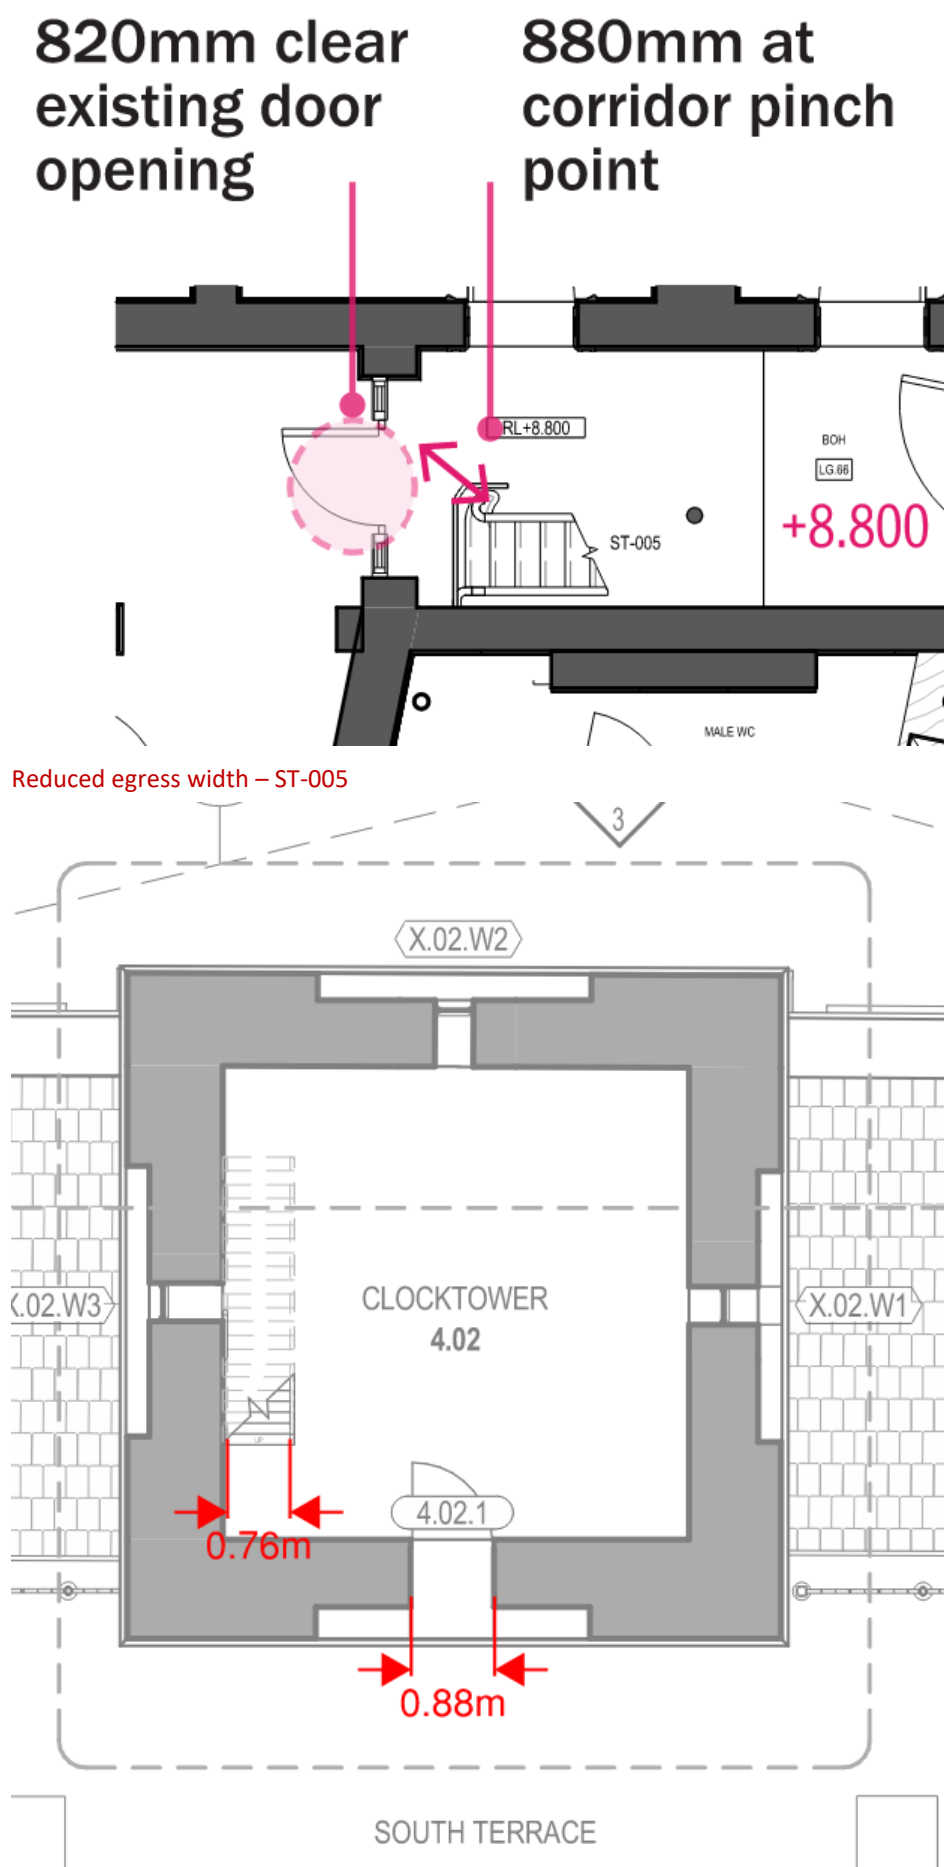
Reduced egress width – Level 4 South Terrace and Clock Tower
